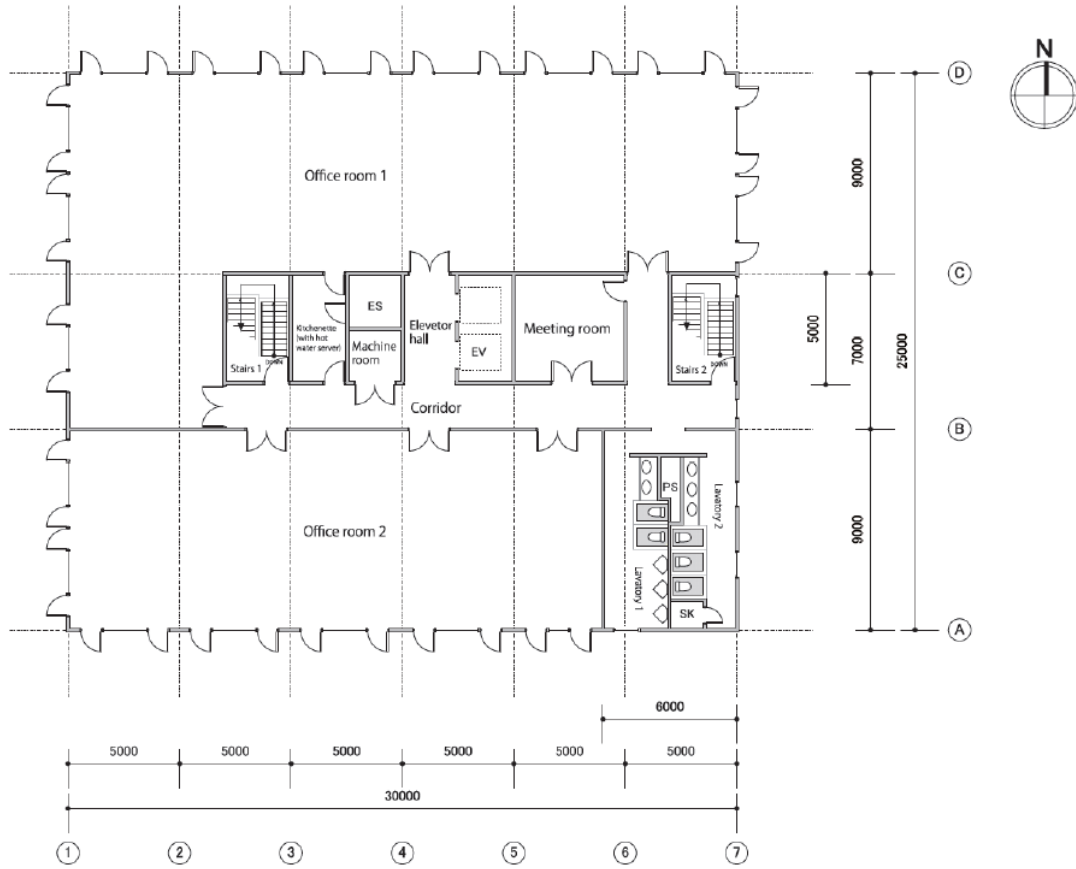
Second case study layout of building - 1st to 6th floor - ISO 18523-1-2016
